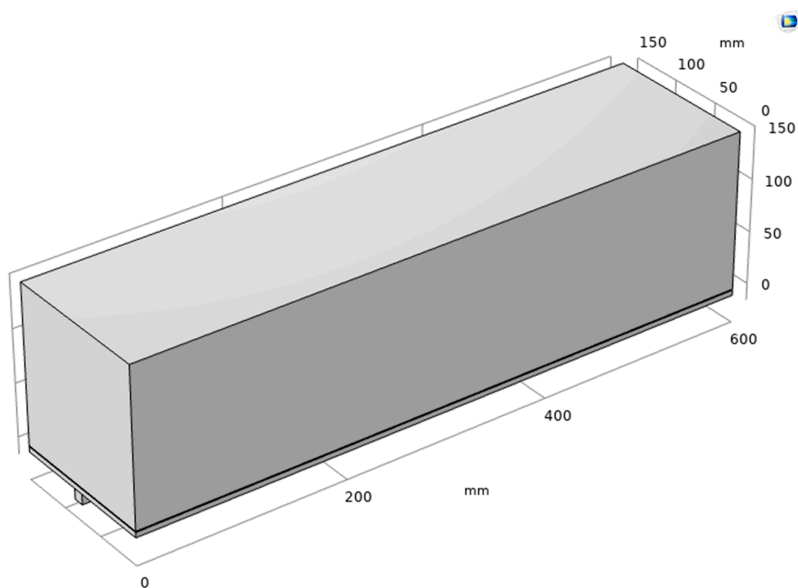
Geometric modeling diagram of steel plate reinforced concrete.
